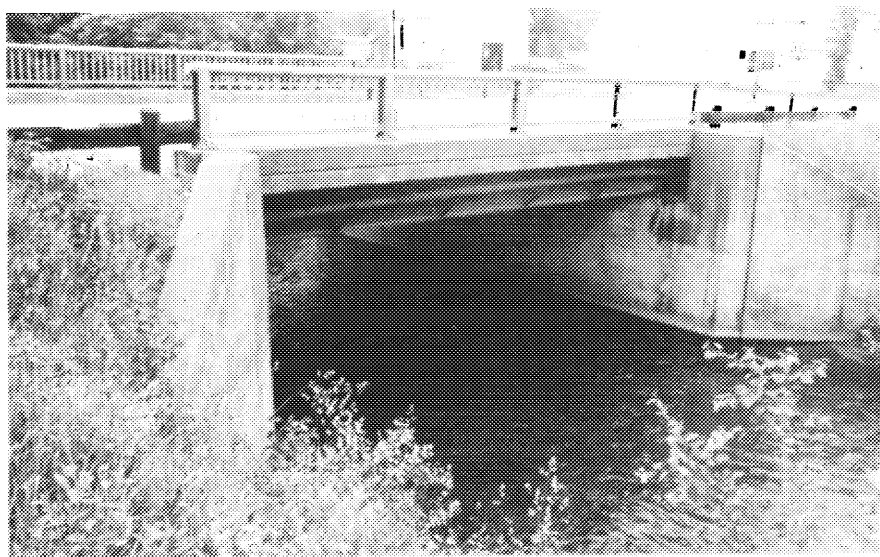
Ayers Brook - Central Street bridge, Randolph, at Mile 0.2.
